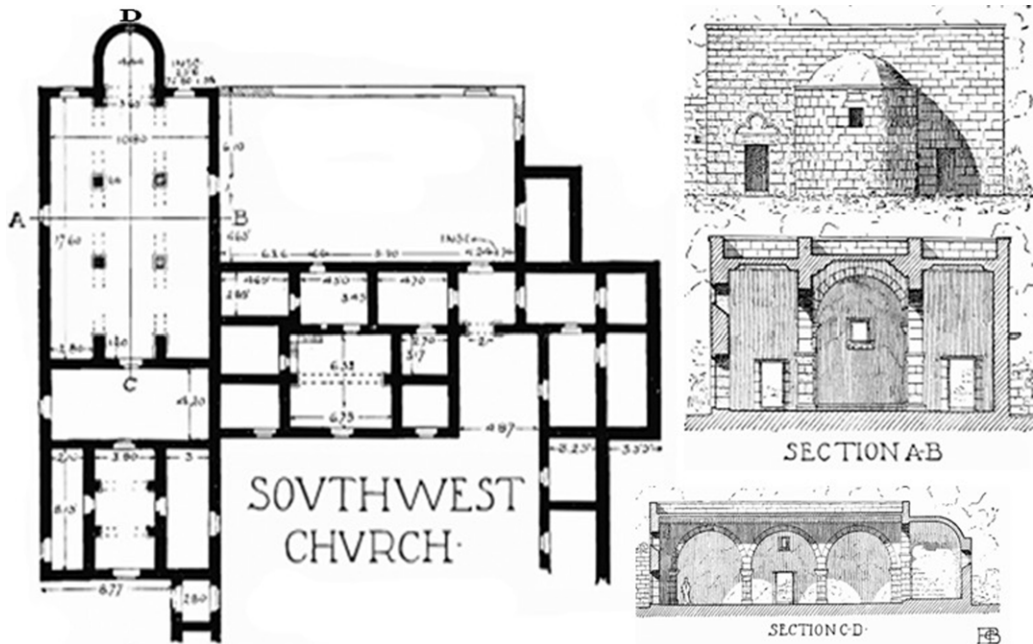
Plan of the Southwest Church (left), and reconstructions of the exterior the apse (upper right), and sections along A–B and C–D lines (Butler 1913:185).
